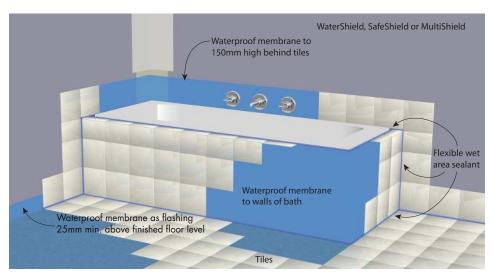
Bath (Without Shower) Installation on Timber Flooring
